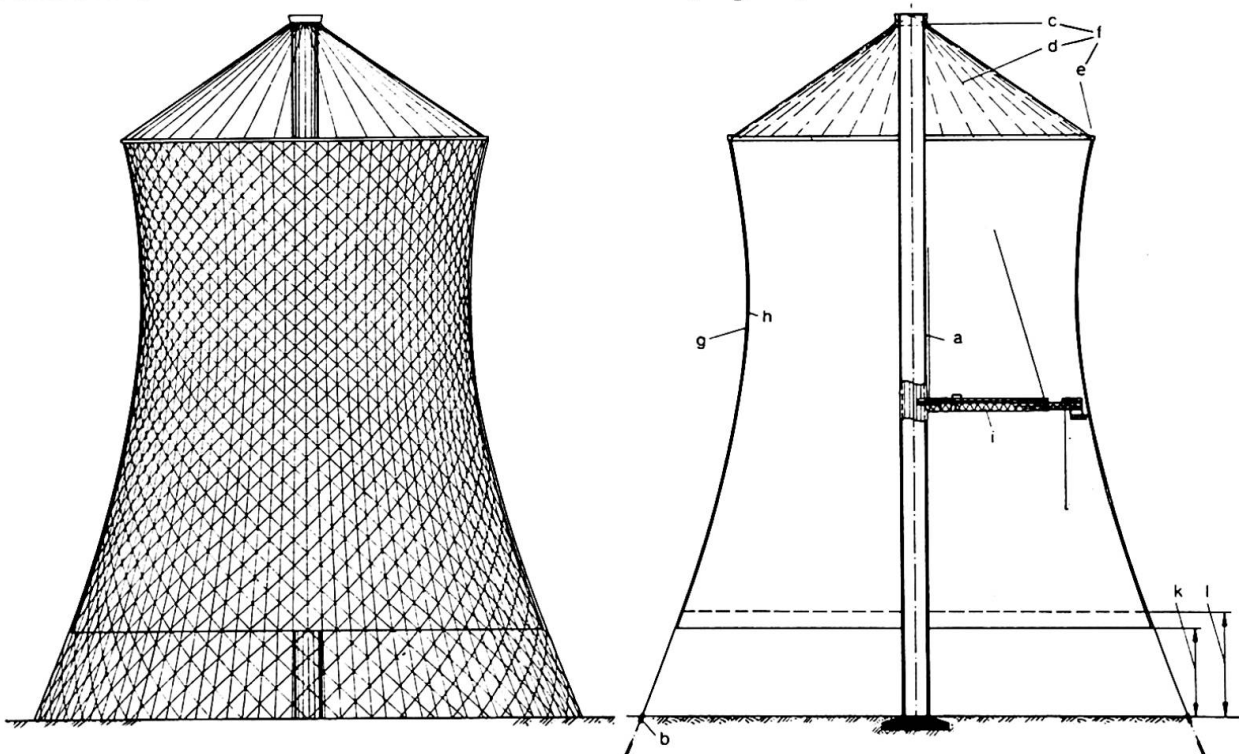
a Mast, b Foundation ring with soil anchors, c Hubring, d Spokes, e Compression ring, f Spoke-wheel, g cable-net mantle, h Cladding, i Telescopic crane, k Air-intake opening, l Cooling elements resp. trickle plant
